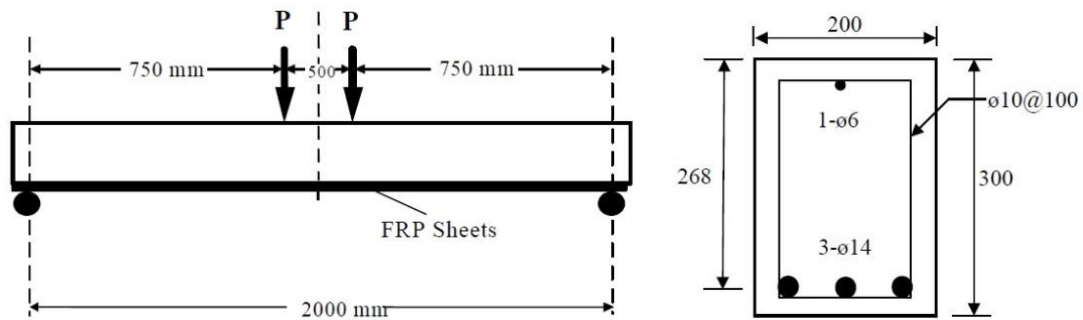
Cross section of Group-1 beam specimens strengthened under scheme-1.
